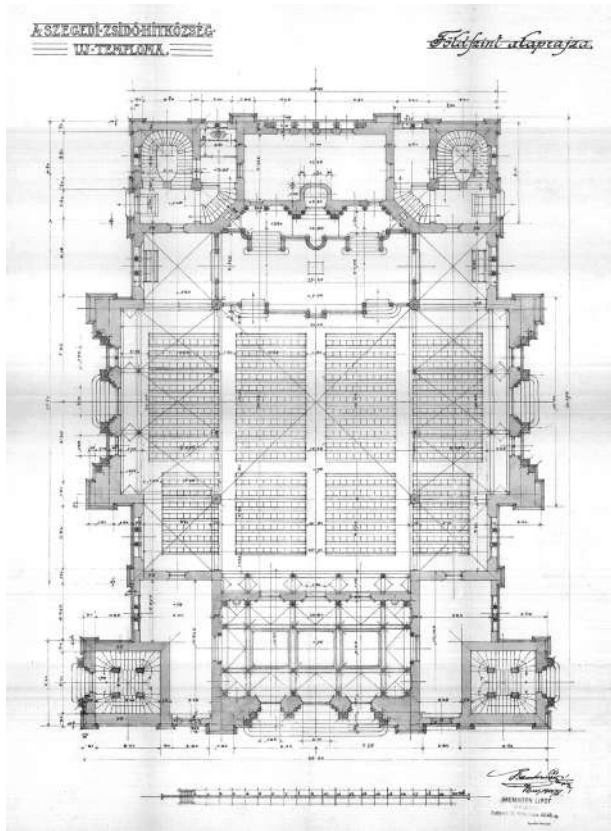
The ground floor plan of the New Synagogue, 1900, Lipót Baumhorn.
